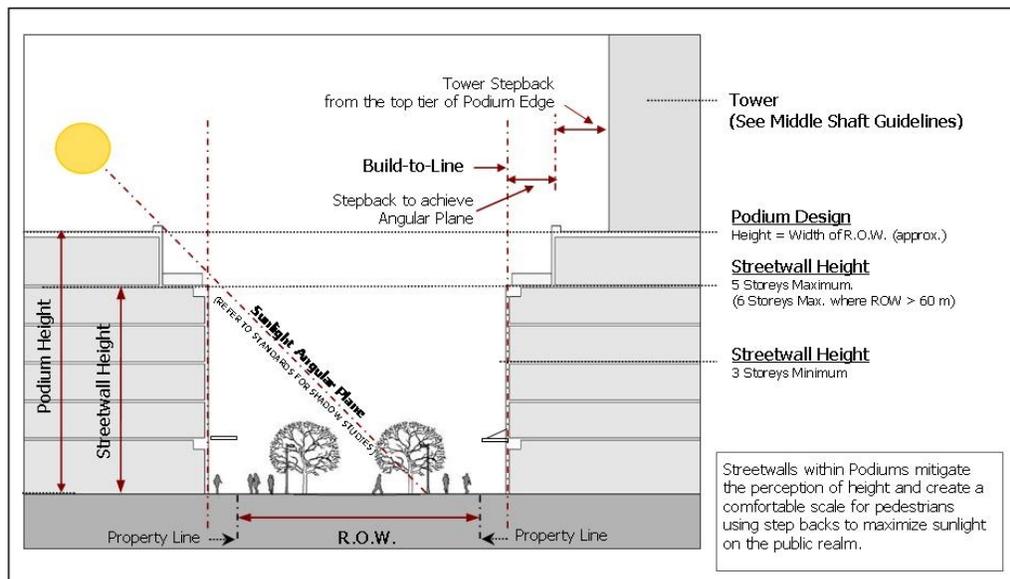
Podiums and their streetwalls will be designed with stepbacks at the upper storeys to provide light filled sidewalks and boulevards in the Downtown Core.
